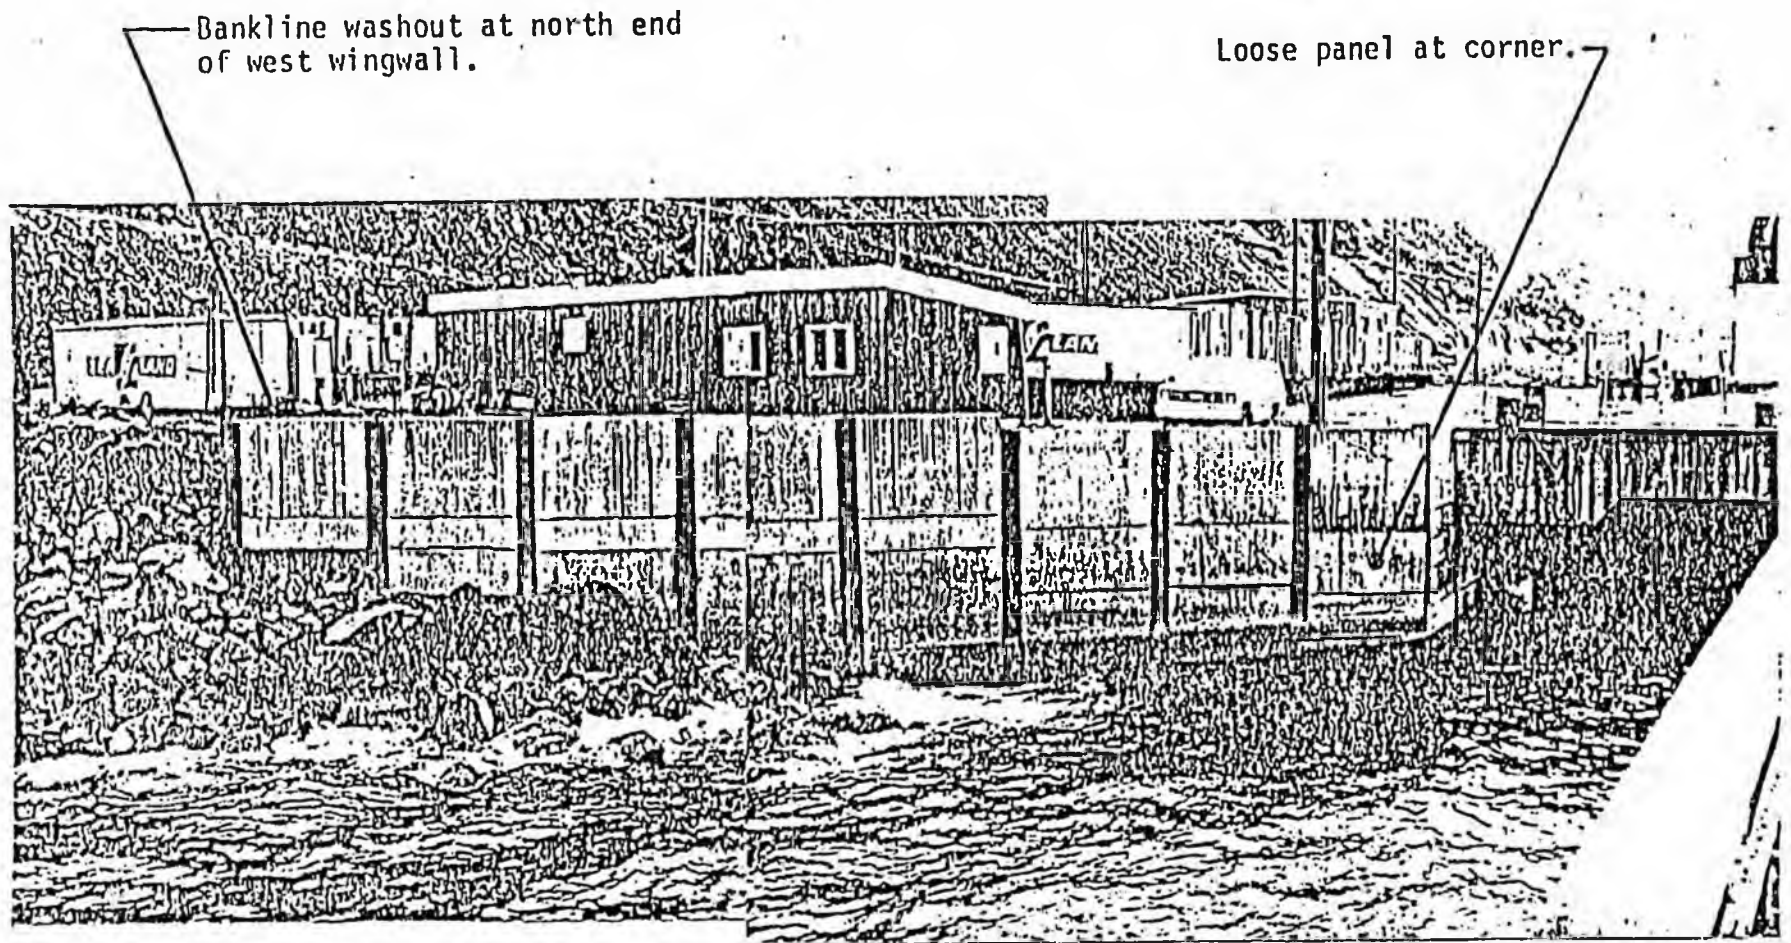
Overall view of west wingwall. Storm damage relatively minor in comparison to east container storage area and east wingwall.
